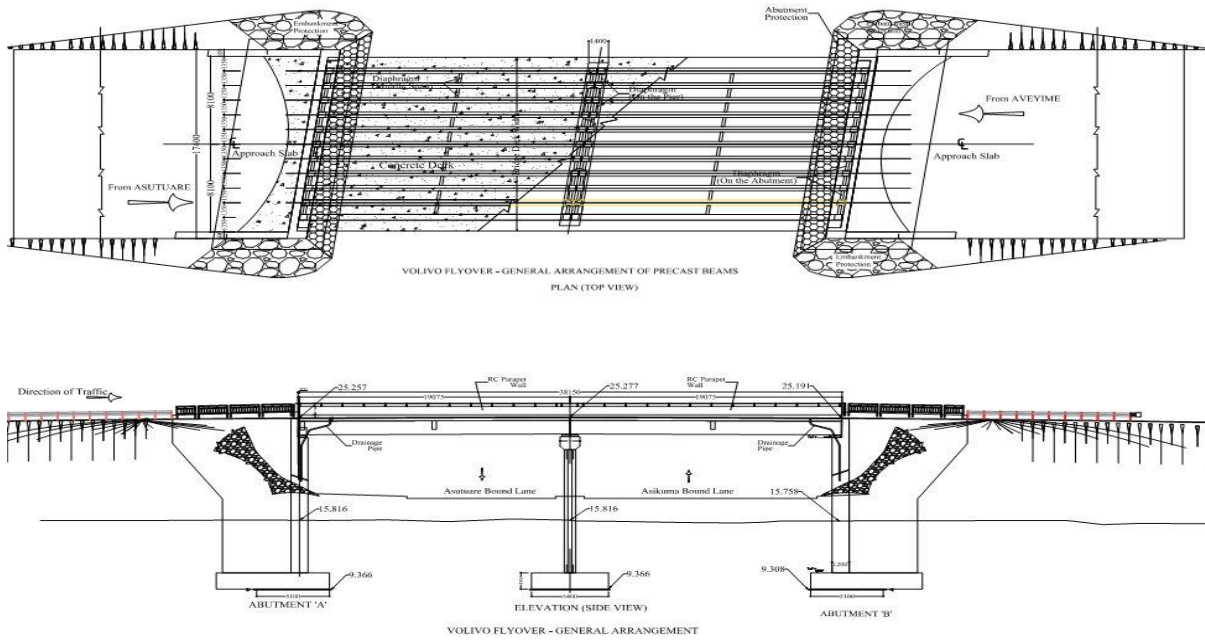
Bridge on Volivo Interchange at CH. 29+350 on Section 1 Project Road
